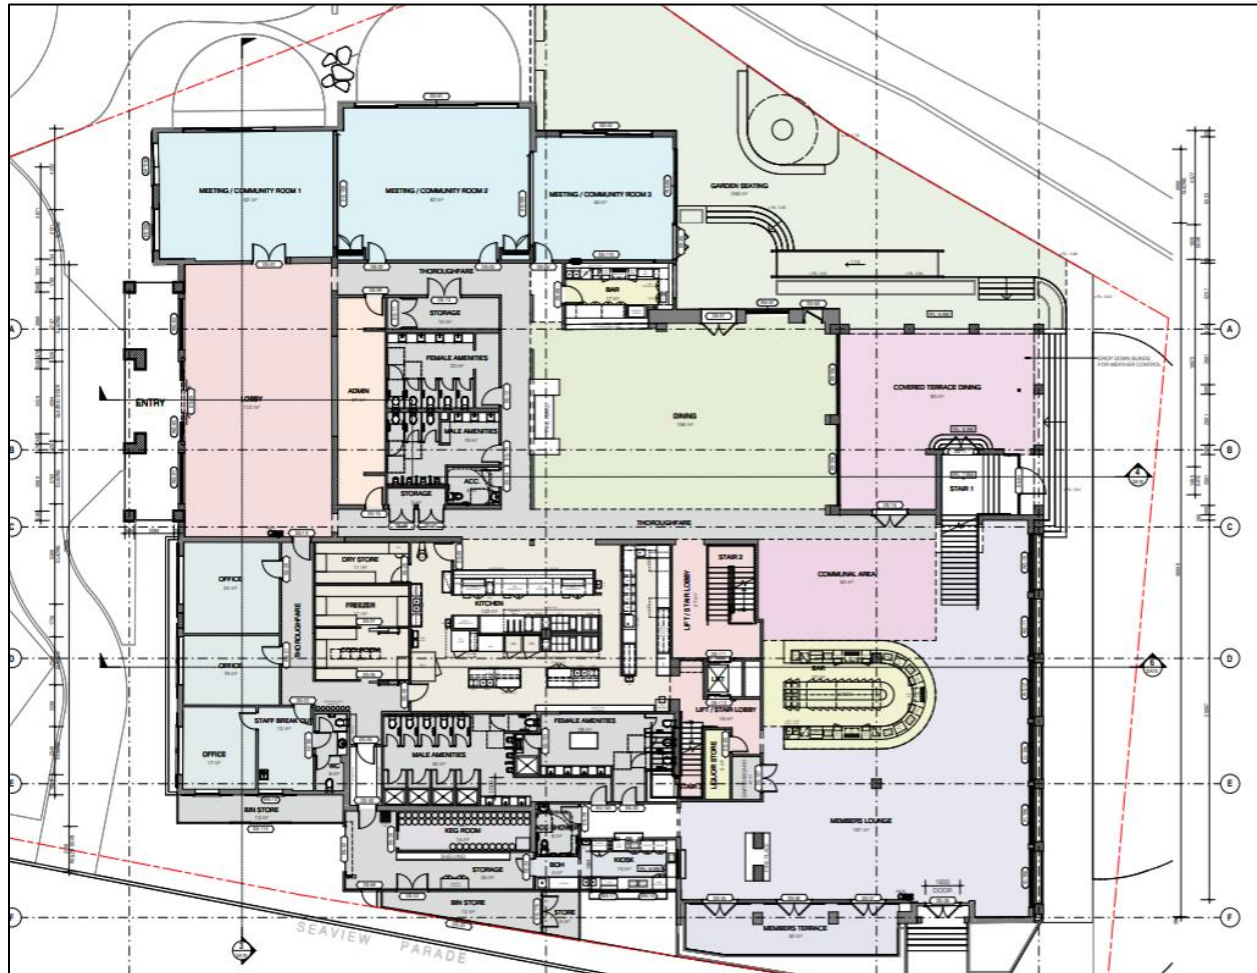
Proposed Ground Floor Plan (Source: i2C; January 2025)
